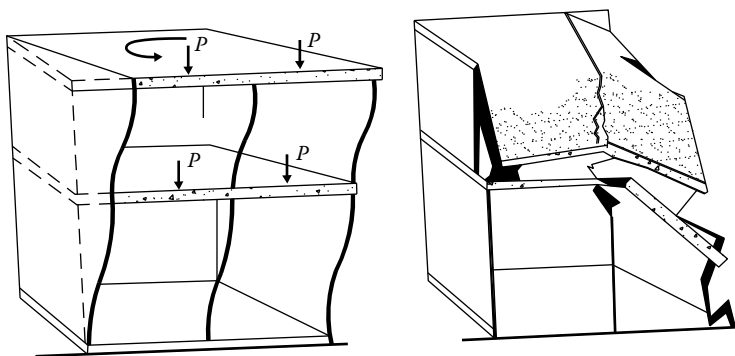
Heavy floor collapse: Major force is in inertia of floors and is concentrated at each level. If columns crack and fail, heavy floors collapse.
